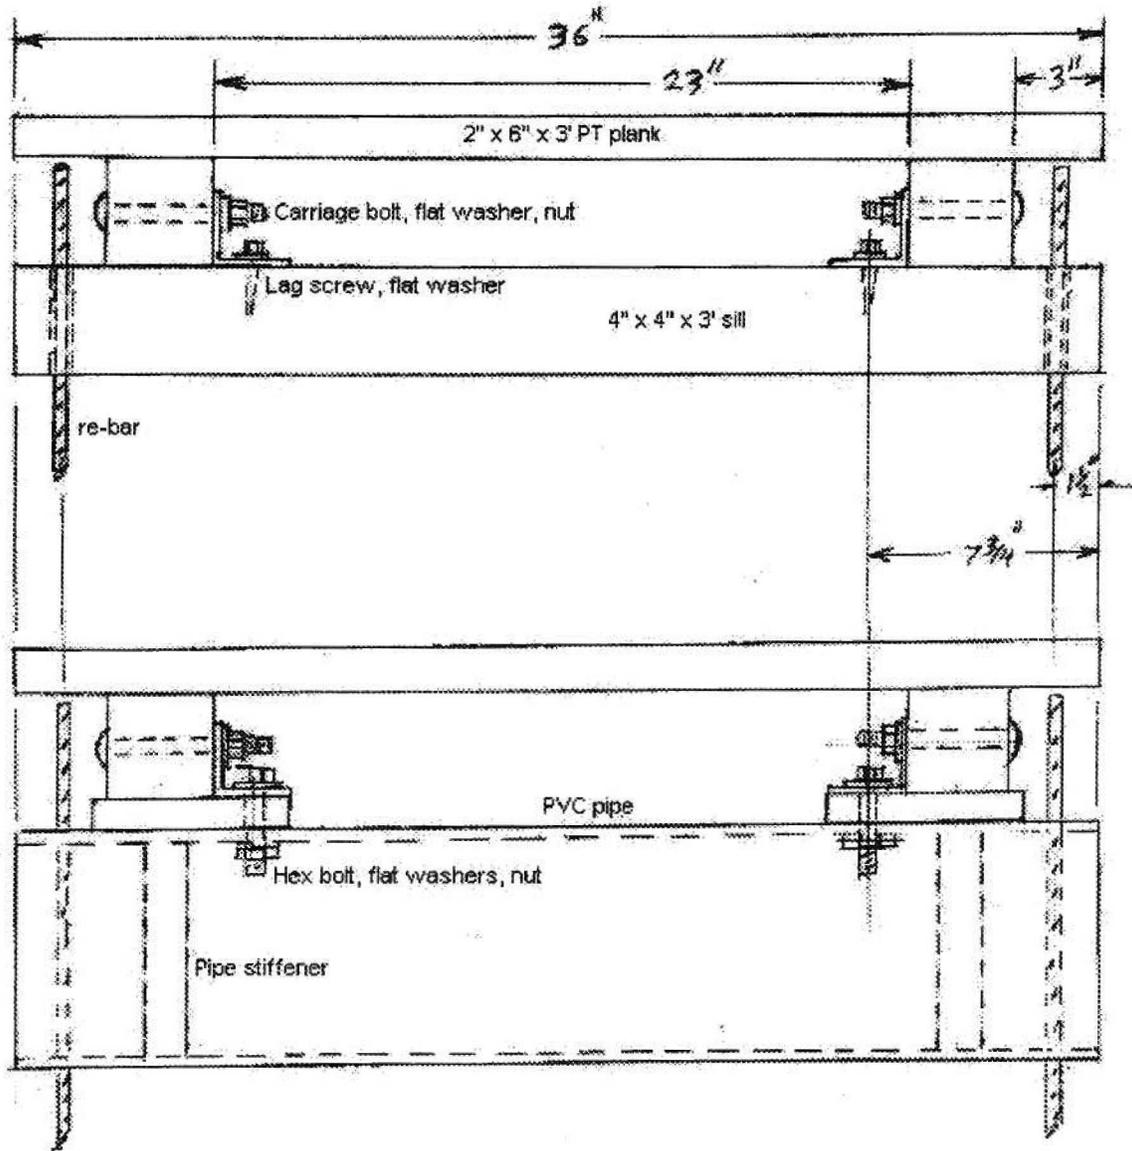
Detail of stringer/sill assembly for two types of sills.
